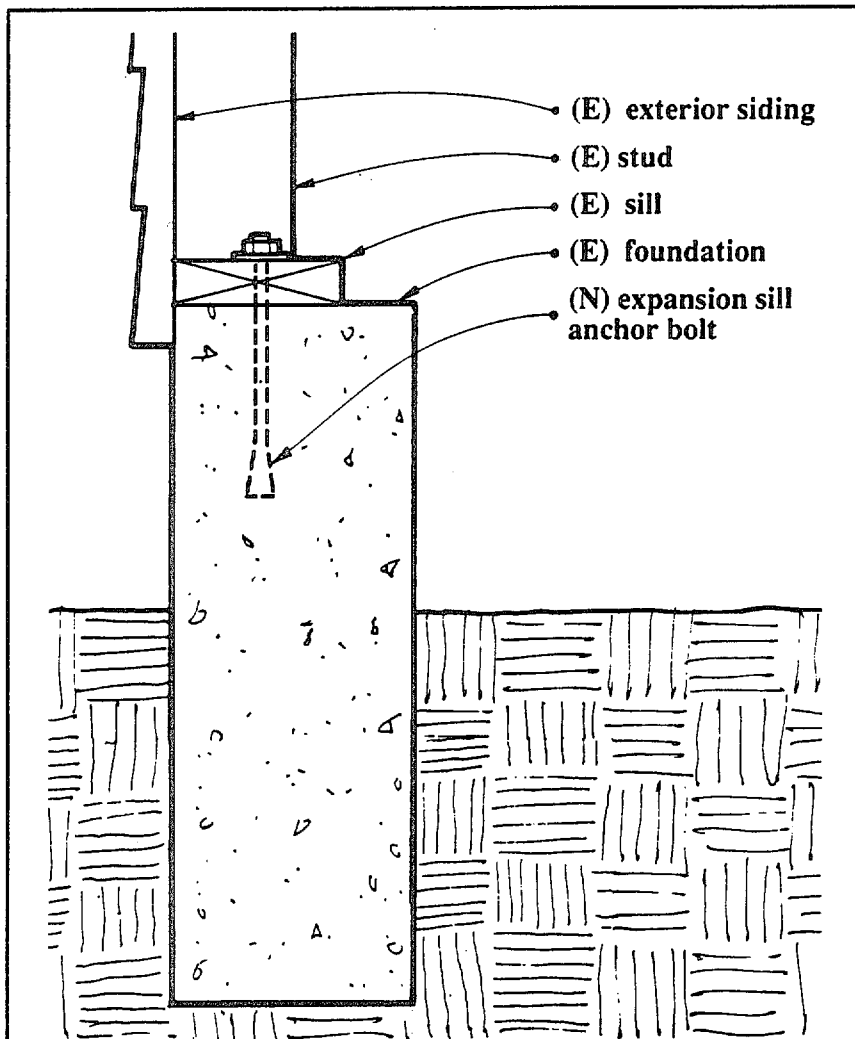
Providing wall to foundation anchors.
